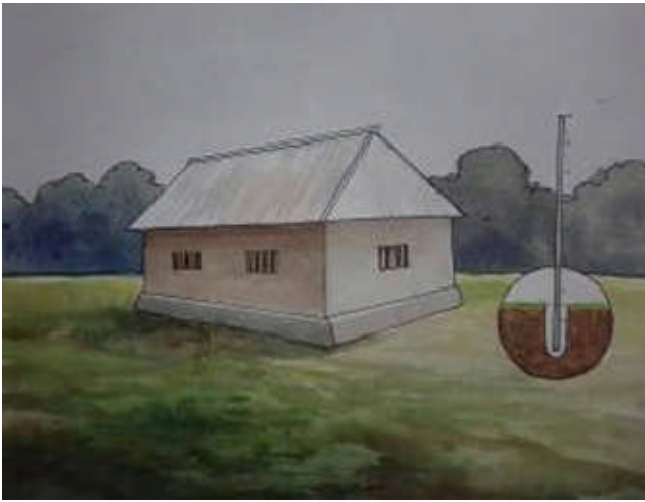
and 20: Foundation base ought to be within strong soil layers; subsiding base triggers crack in the wall
